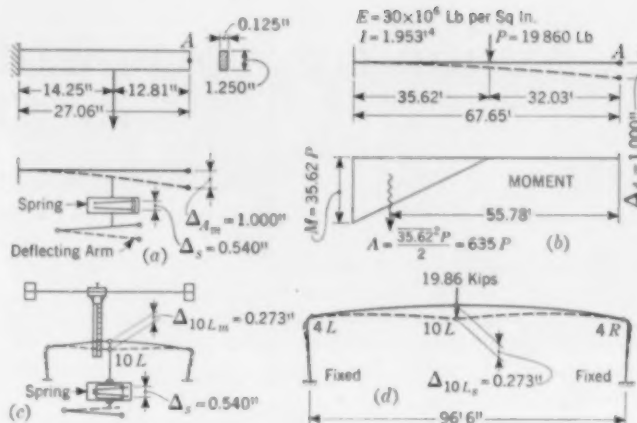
DEFLECTION DIAGRAM SECURED WITH ELASTIC SPRING (a) Model Cantilever, (b) Prototype Cantilever, (c) Model Fixed Frame, (d) Prototype Fixed Frame
